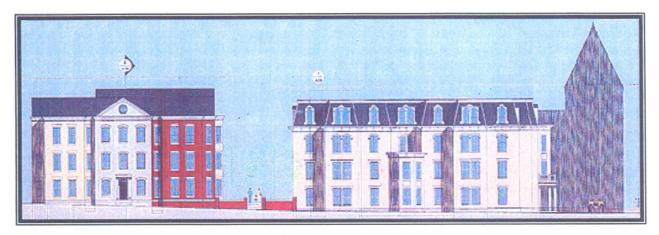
View of Montgomery Street Elevation as Proposed for the December 20, 2006 BAR
